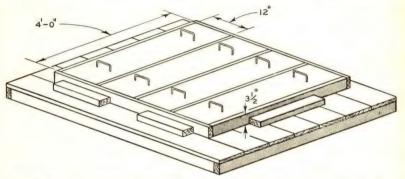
Forms for Making Reinforced Concrete Slab Sections for Septic Tank Cover
